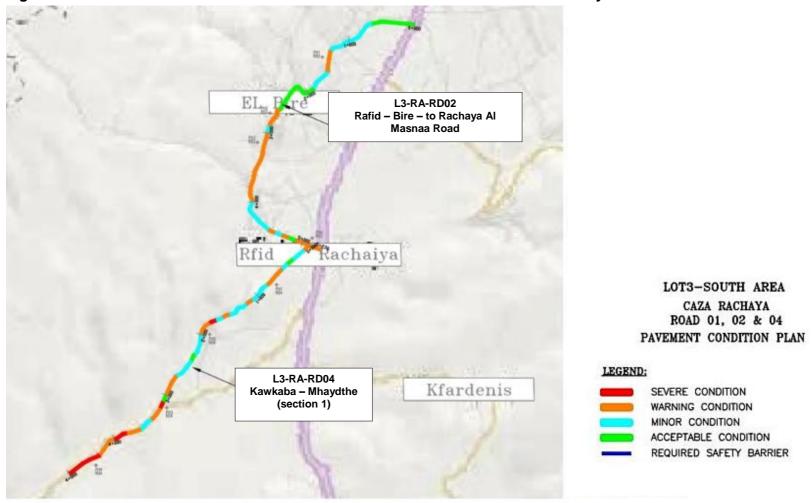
Pavement Condition Plan of Road L3-RA-RD02 and L3-RA-RD04 in Rachaya Caza
